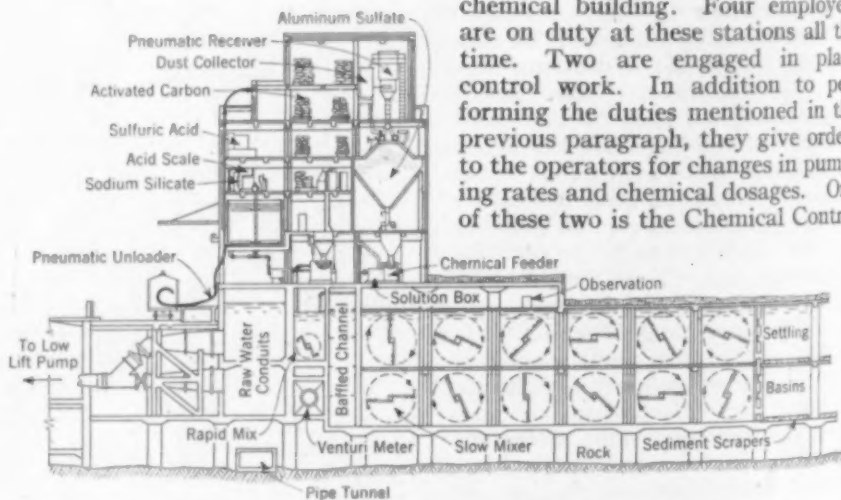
SECTION THROUGH CHEMICAL BUILDING AND MIXING BASINS OF FILTRATION PLANT
